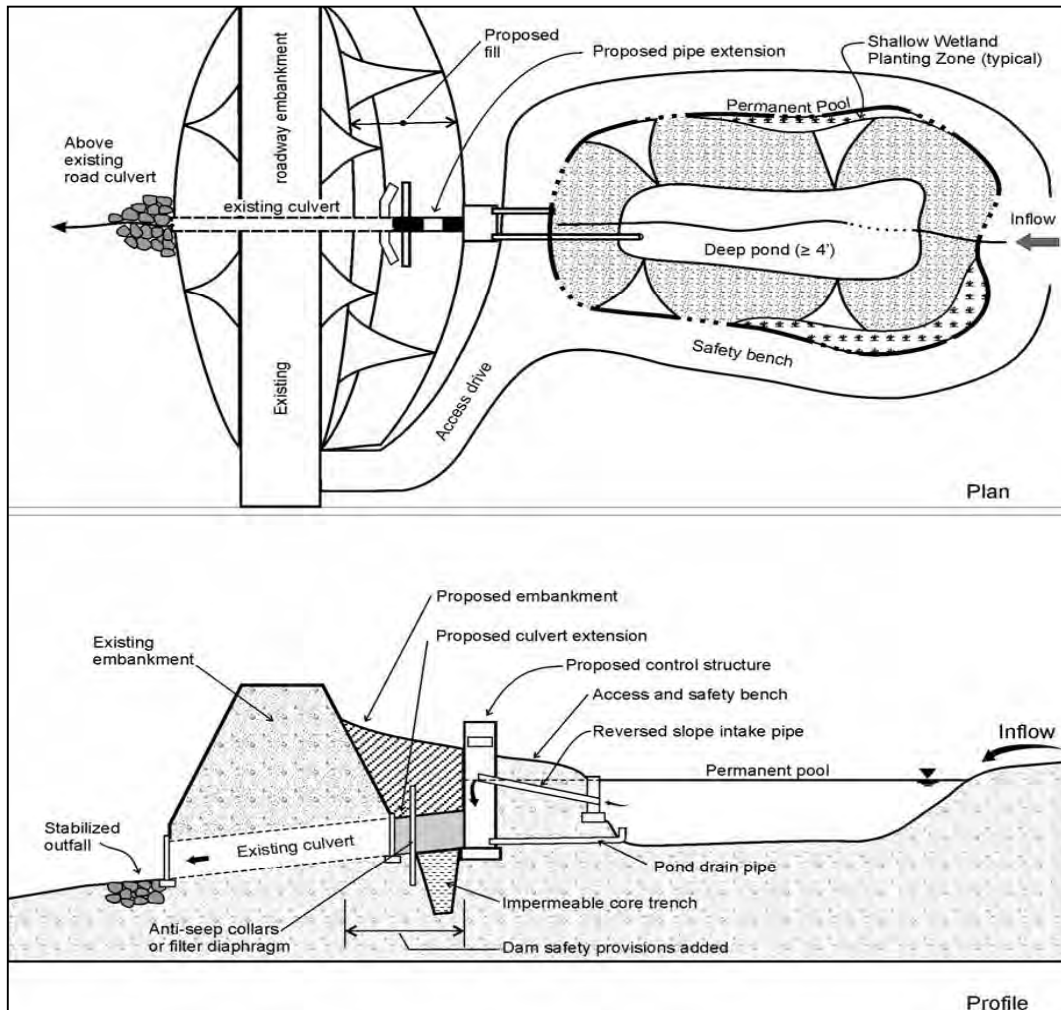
Typical plan and profile of crossing retrofit showing secondary embankment
